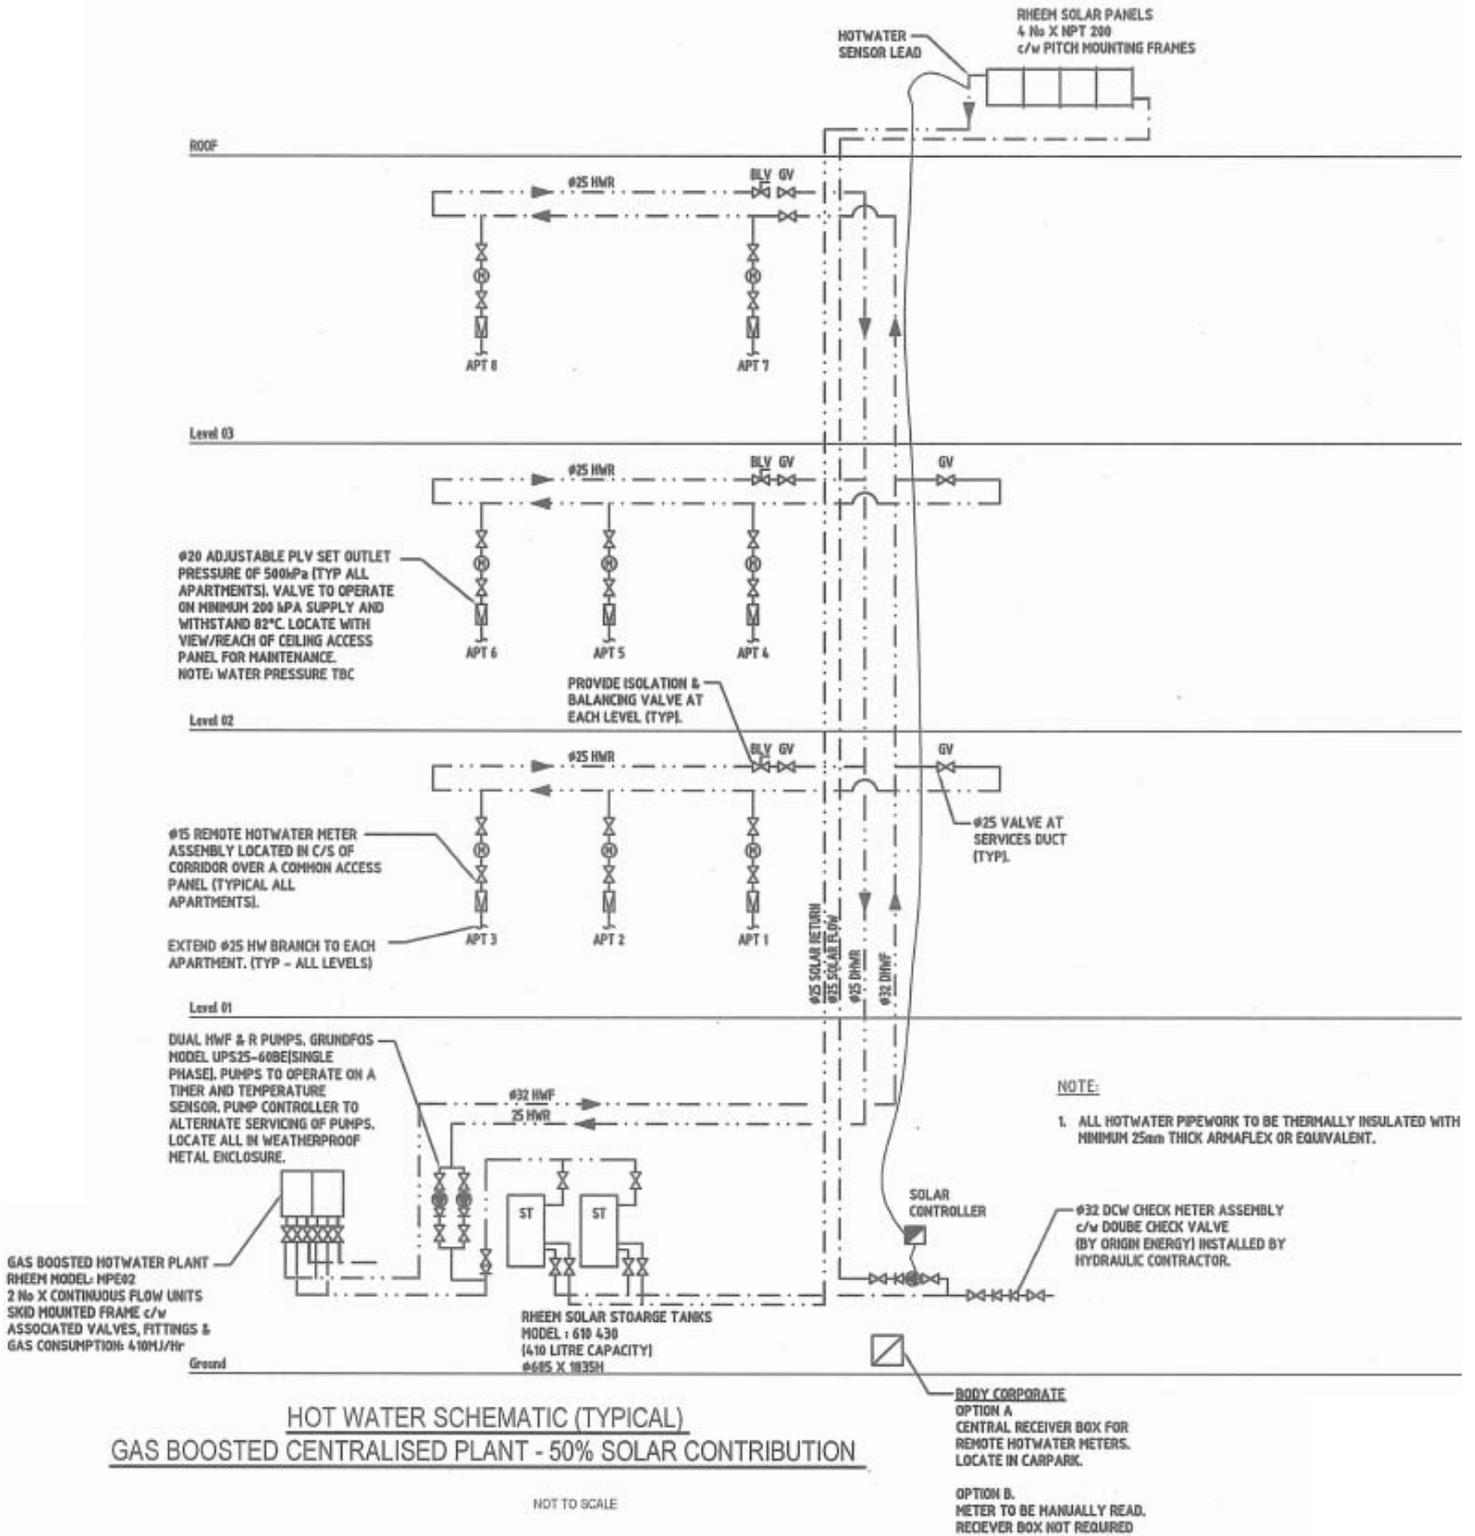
Brahe Place building elevation HWS schematic (Wood and Grieve Engineers 2011a)
